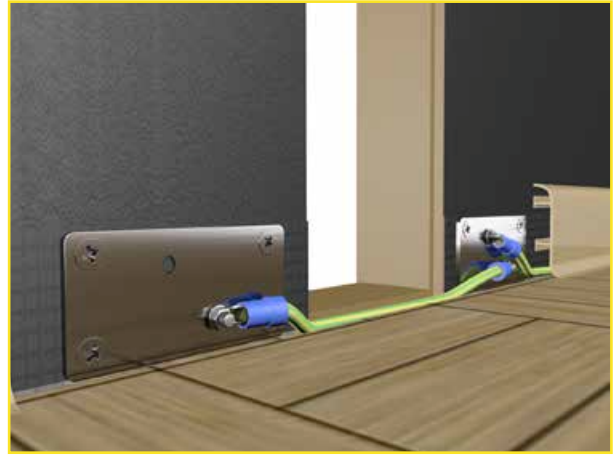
Connection of room openings with or with the help of 2 grounding plates
